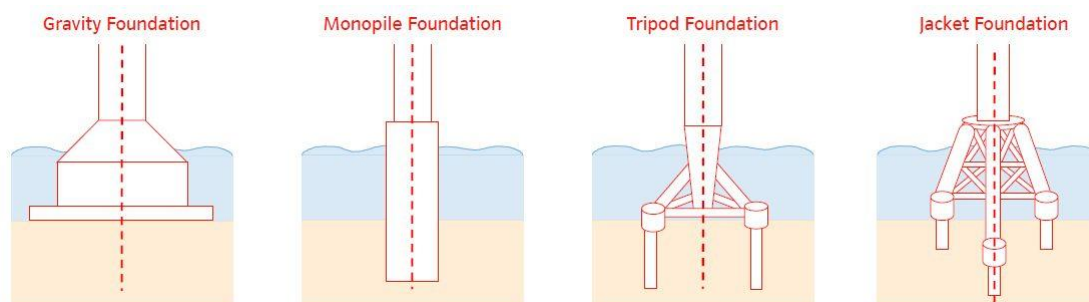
Main foundation concepts: Gravity-based foundation (GBS), monopile foundation (MP), Tripod foundation, Jacket foundation[7]
